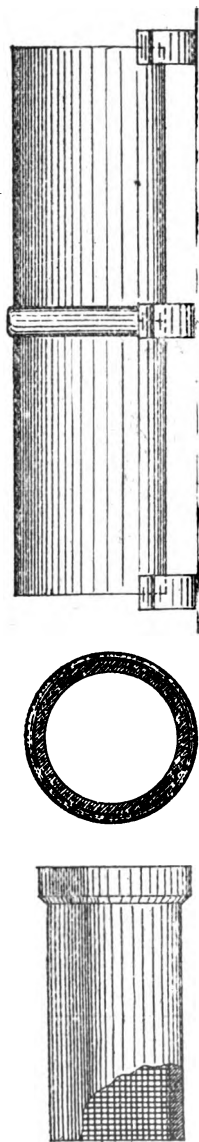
Reinforced Concrete Pipe with Hub, Fig. 115.—Reinforced Concrete Pipe with Sleeve Connection.
